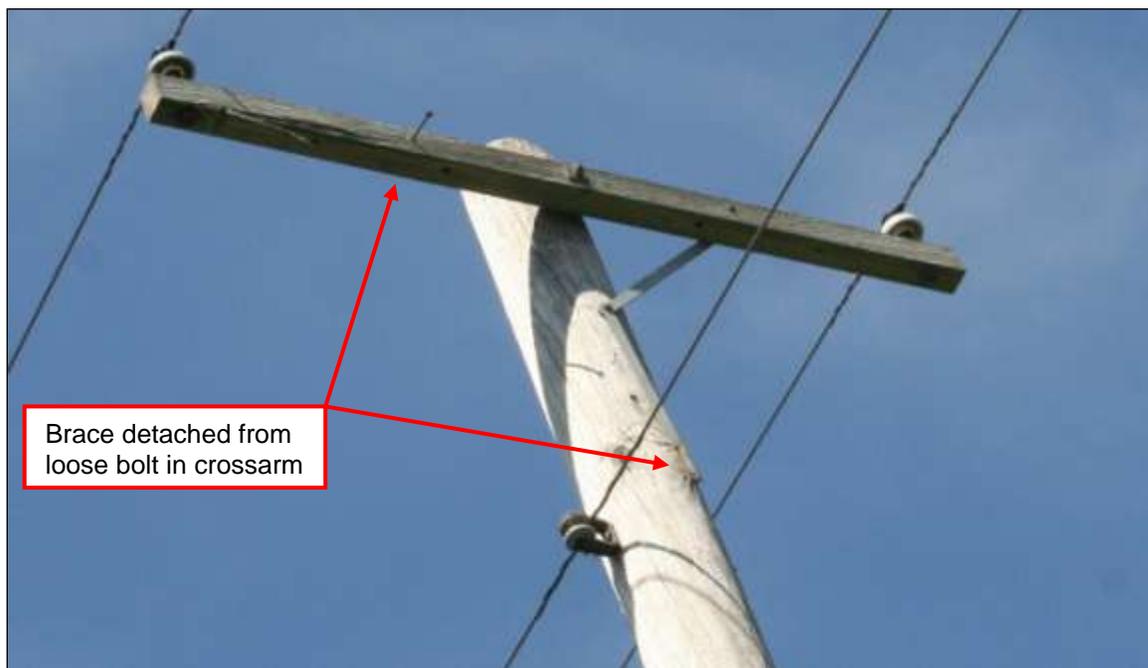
Bolt for brace coming out of crossarm – brace detached (N70330)
